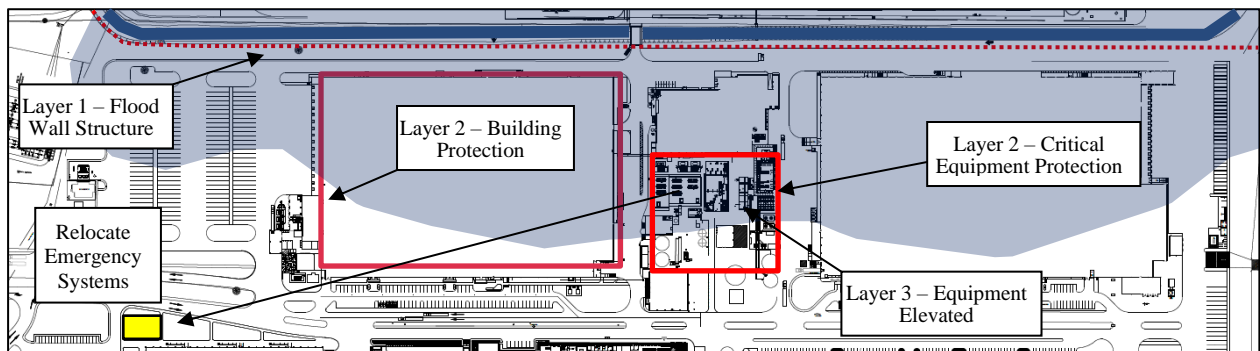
Building in Physical Layers of Protection – Primary Flood Walls, Secondary Building and Equipment Protection
